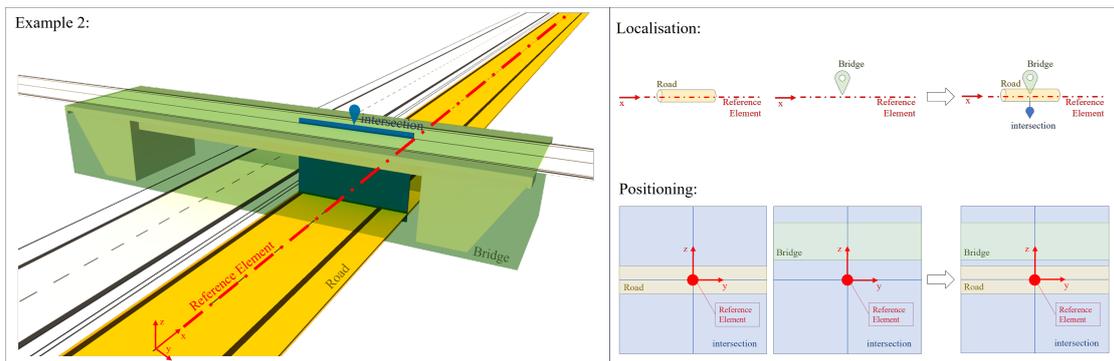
Example 2: A road underpasses a bridge or a bridge overpasses a road
